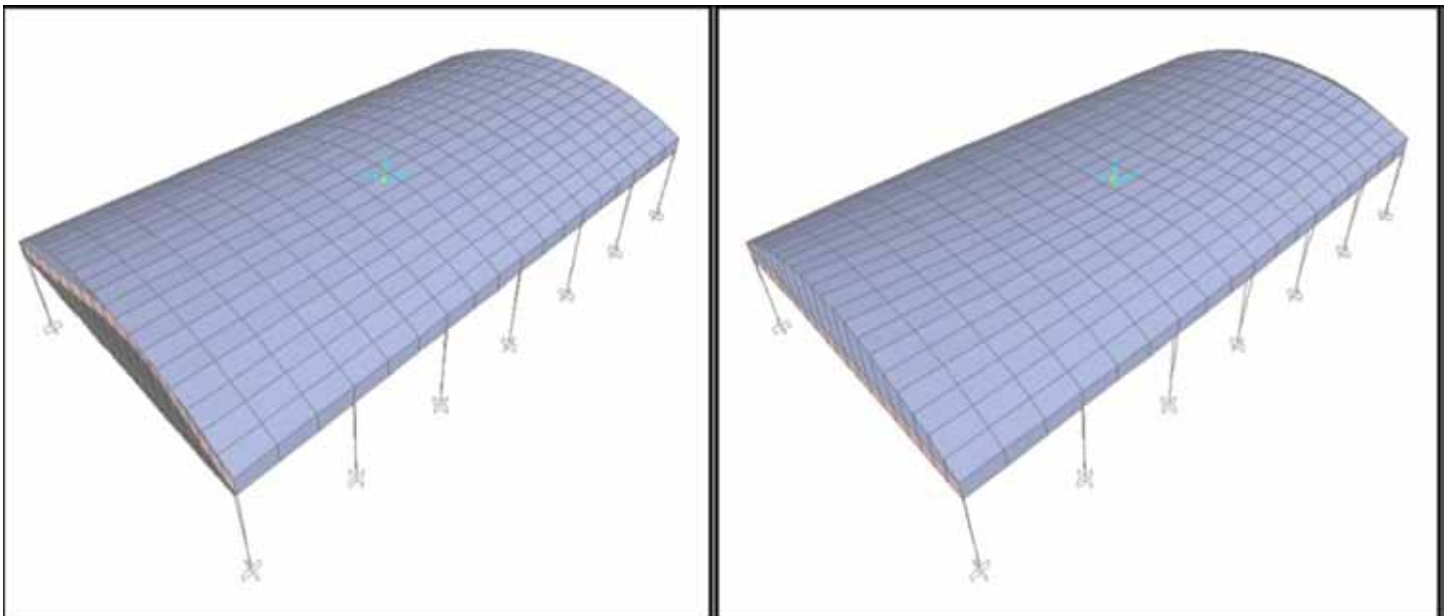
(a) Second mode shape (b) Fifth mode shape of single barrel shell structure
